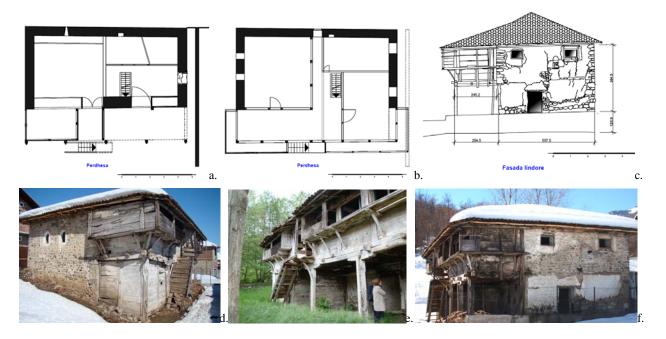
The dwelling-garret type in Lebusha, Kosovo; a. ground floor layout; b. first floor layout, c. east elevation; d. west-south view; e. south view; and f. east view.
